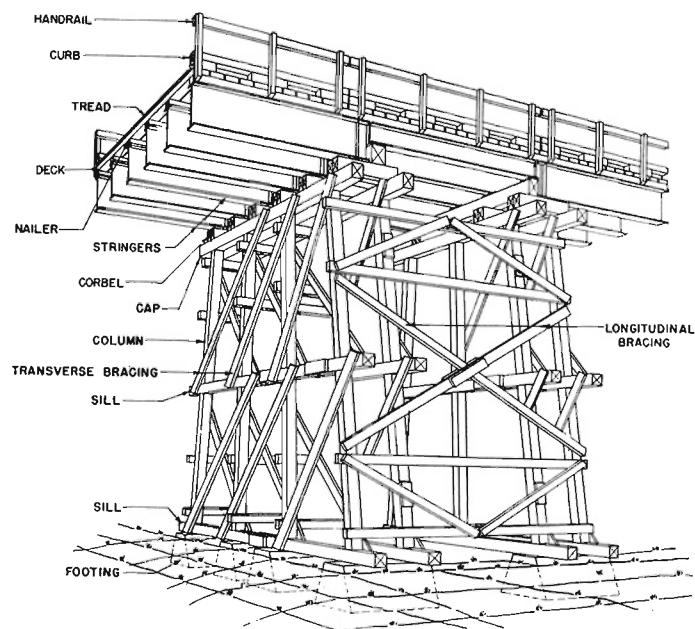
Highway bridge, class 25, double-lane, steel stringer spans, framed timber tower on concrete pedestals.
